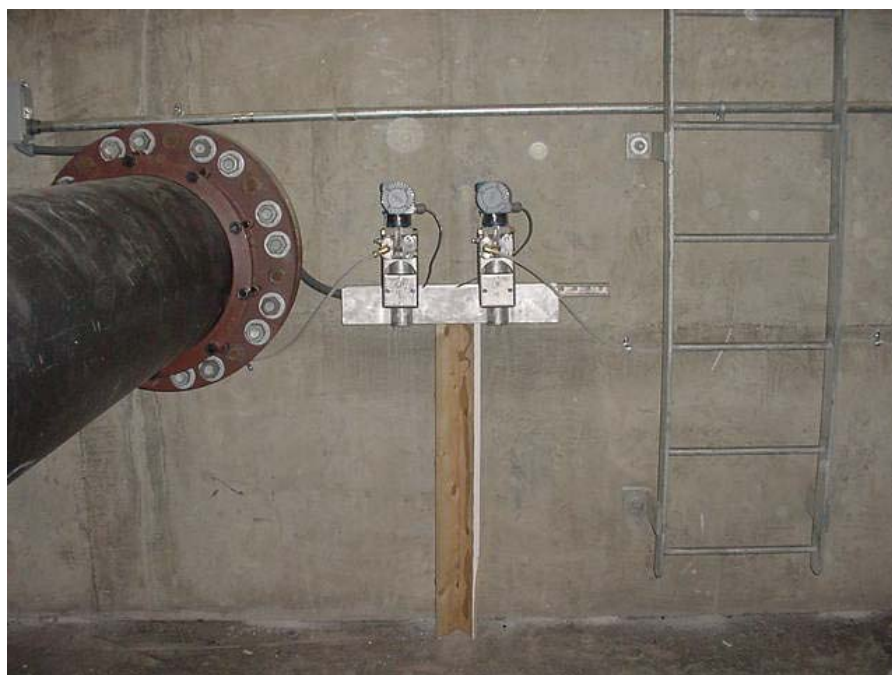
B. Cone Valve Pressure Transmitters O-9 and O-10
